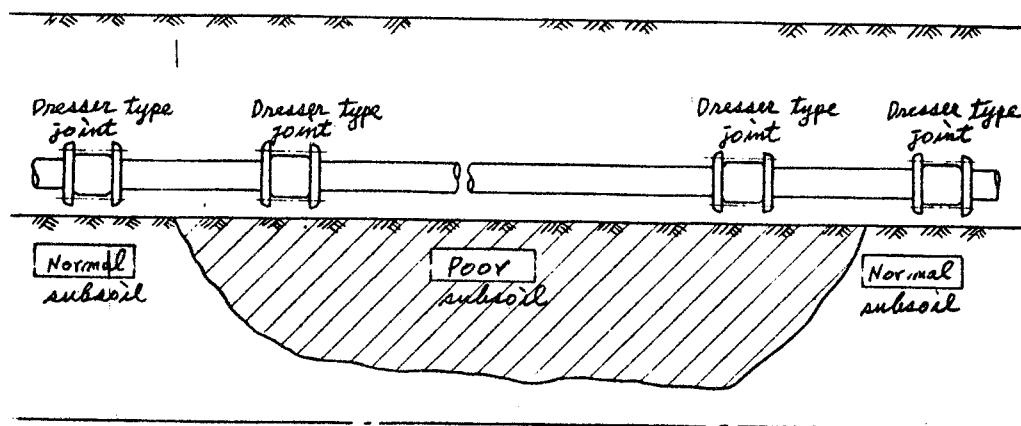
POOR SUBSOIL WORK (SANDPROOFING SHEET WORK)
